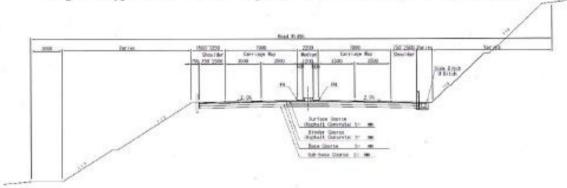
Typical Cross Section of Earth Section (Bypass between Nalinchowk and Sanga)
